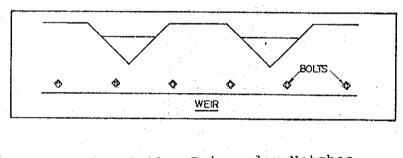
Triangular Notches (Ref. Book No. 1)
